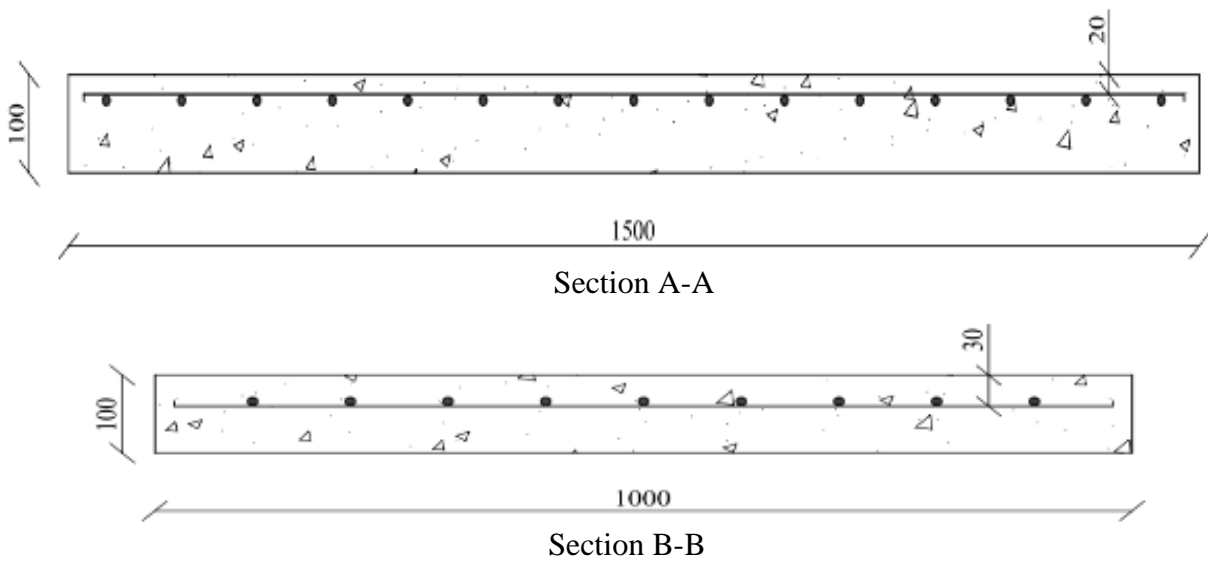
Typical RC slab section details (Dimensions in mm)
